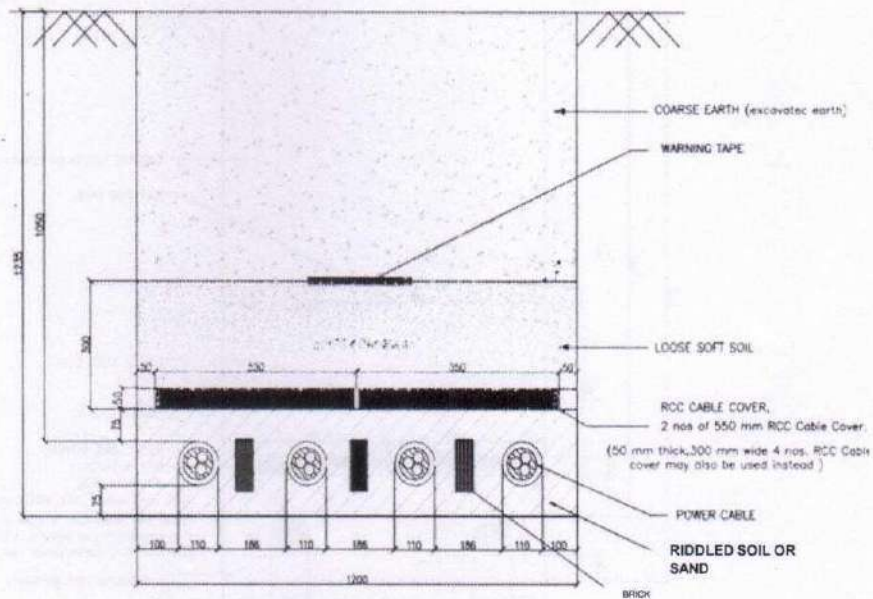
33kV Buried Cable for Double Circuit
